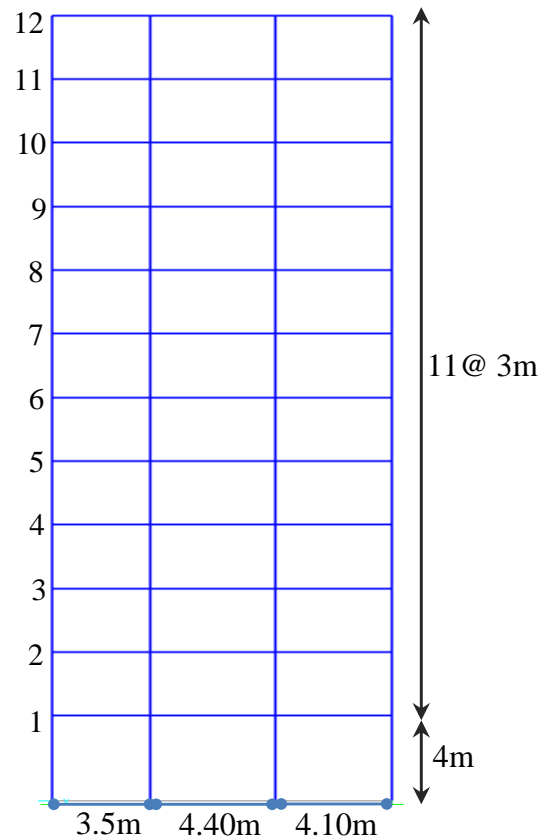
Elevation view of the 12-story reinforced concrete building frame model.
